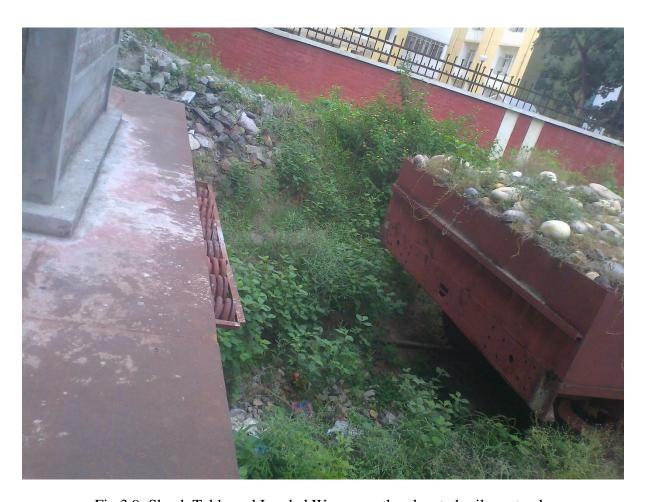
Shock Table and Loaded Wagon on the elevated railway track
